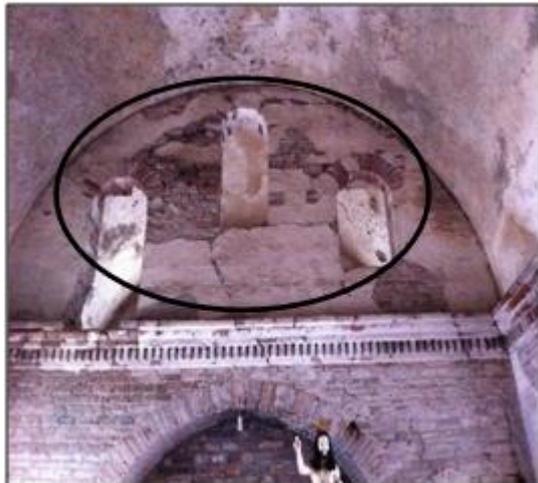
(a): cracks on the walls of the St. Matthias
